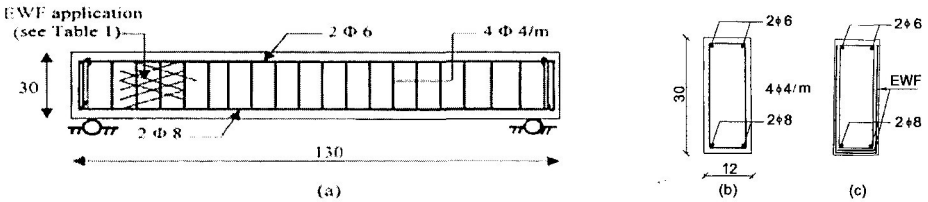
<sup>+</sup> A typical studied beam specimen; (a) Sectional elevation for reinforcement details; (b) Cross section of control beam; (c) Cross section of Beams reinforced with EWF.
